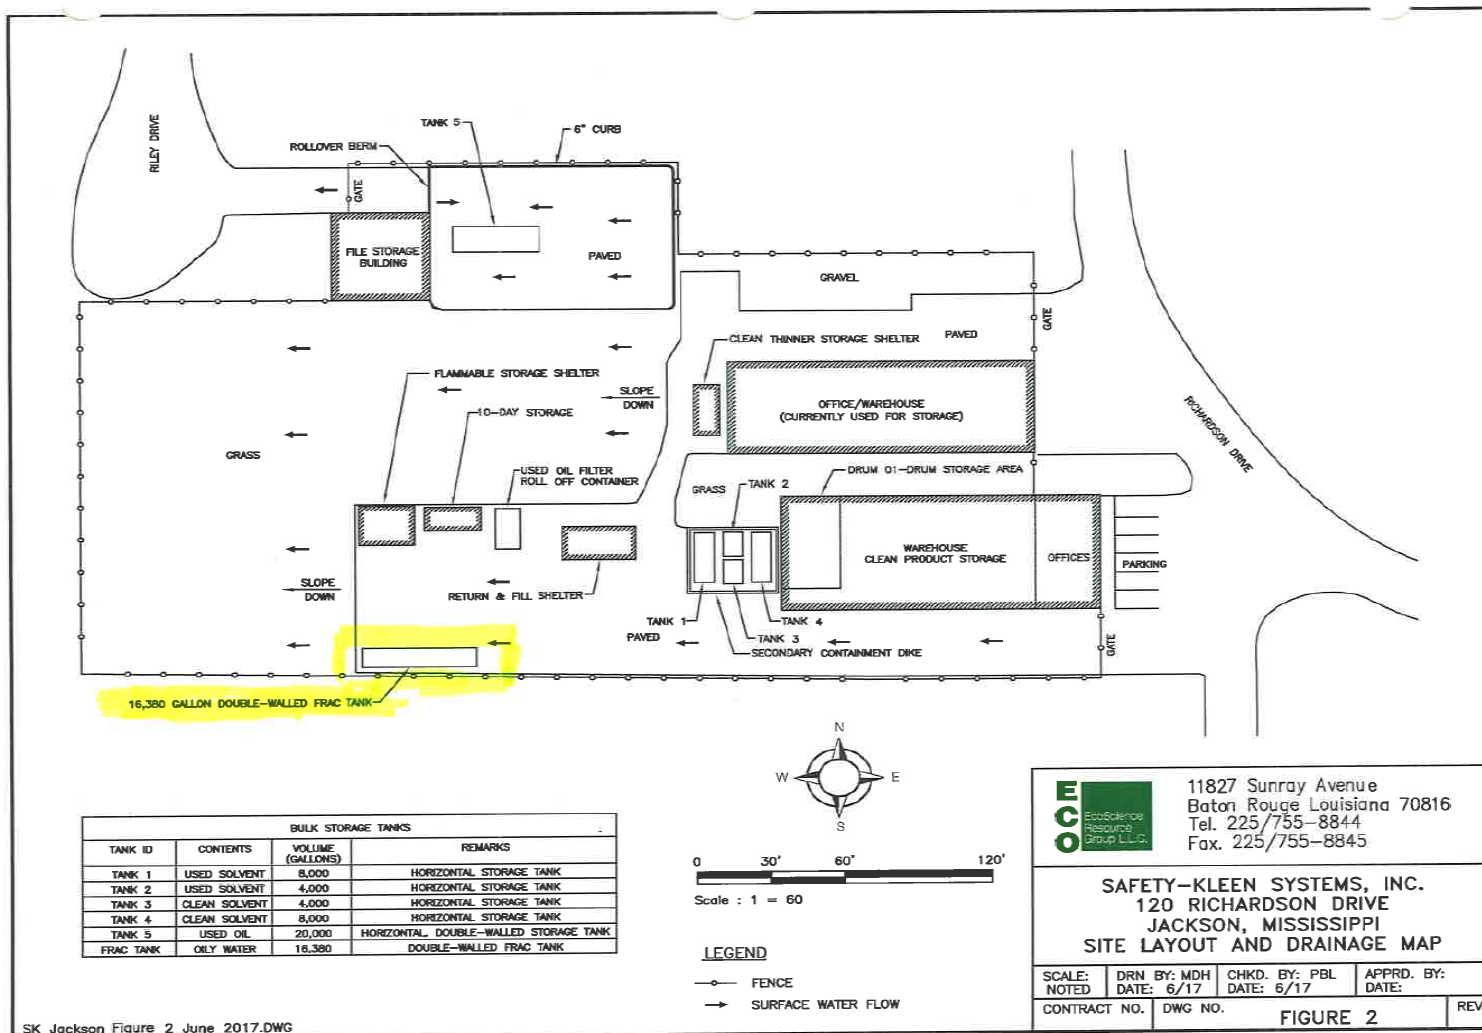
SPCC Plan: Site Layout/Emergency Evacuation Plan
